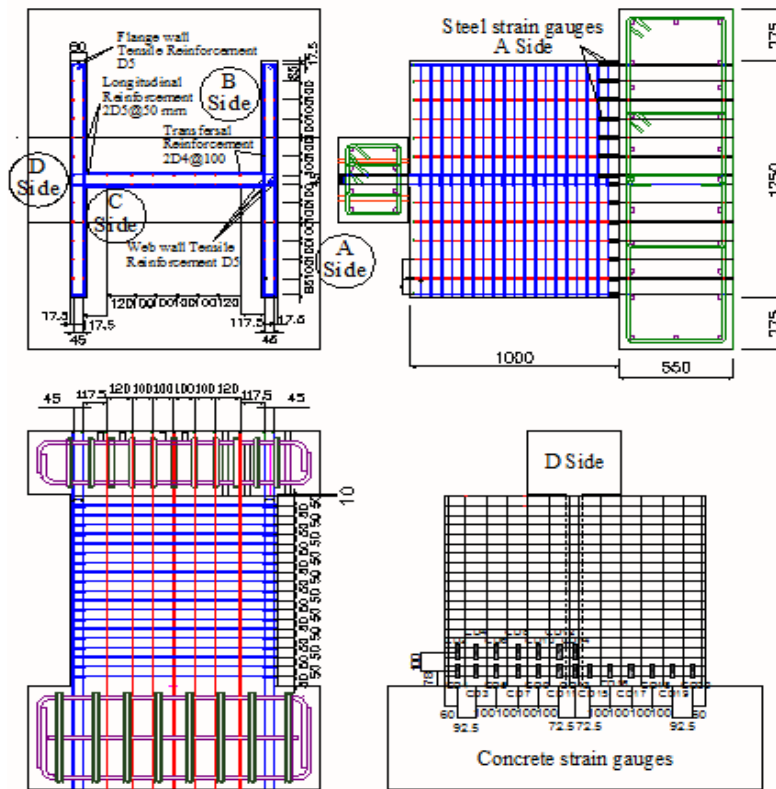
The specimen reinforcement steel bars design and location of steel and concrete strain gauges
